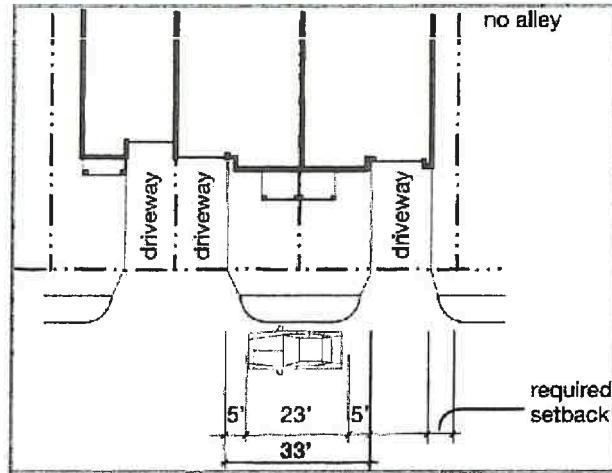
TOWNHOUSE DRIVEWAY SPACING
